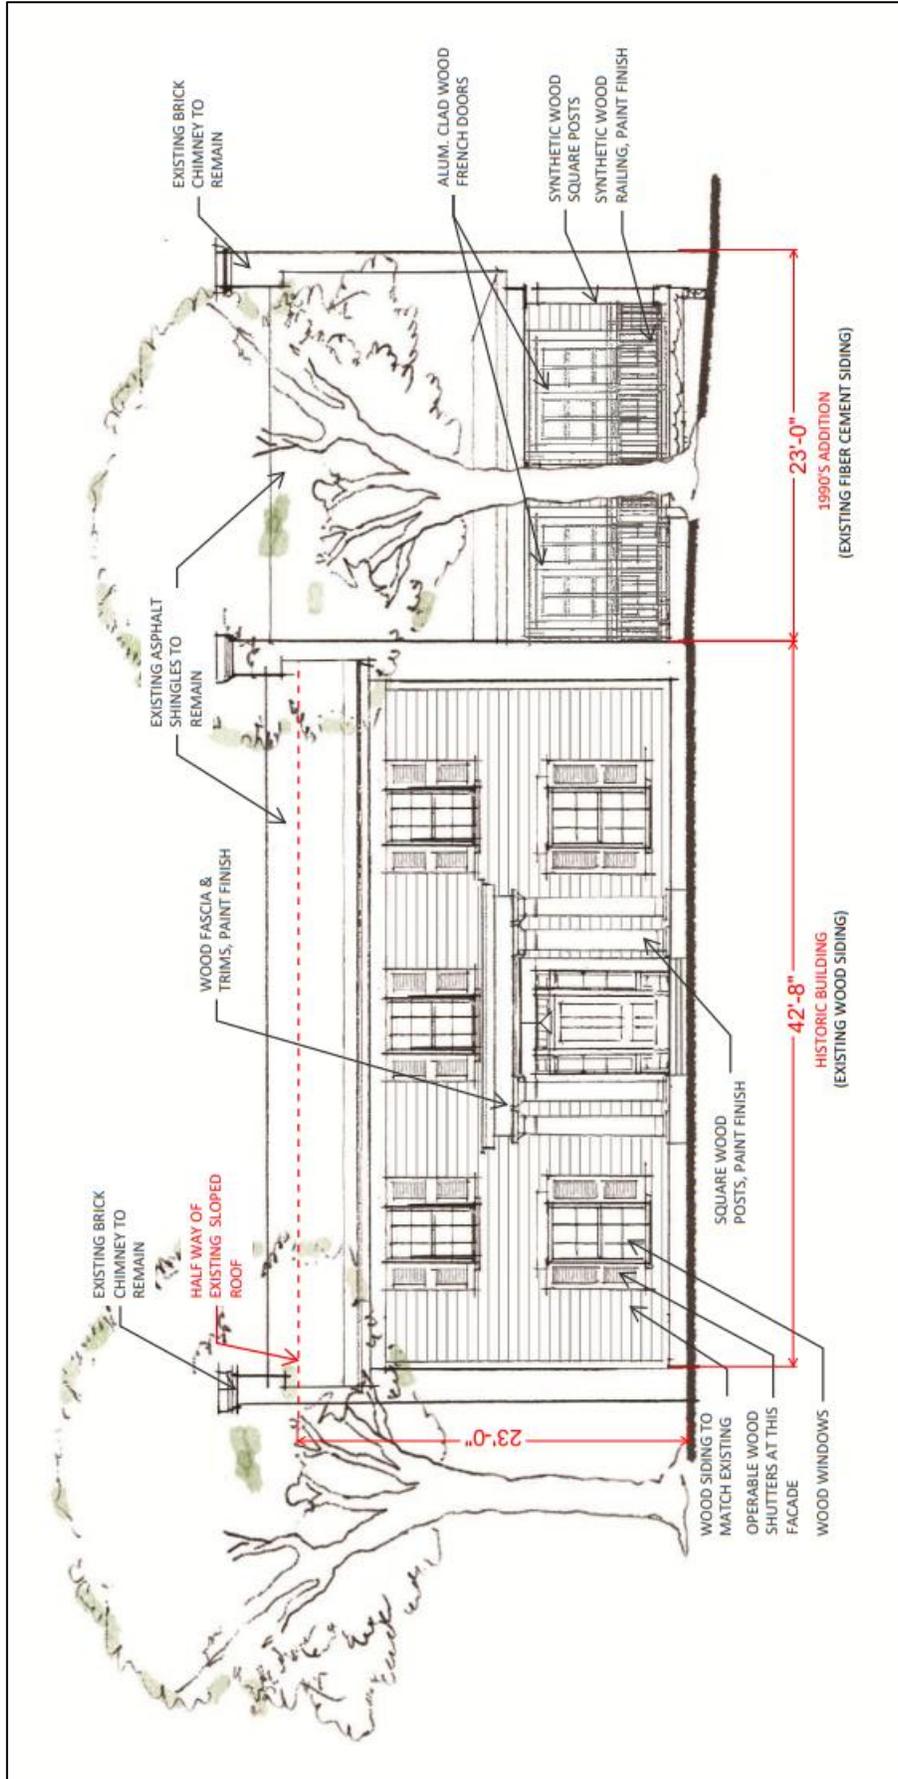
The new façade previously approved by HPC in 2021 (rendering from applicant). Dashed line indicates building height, as defined by the UDC.
